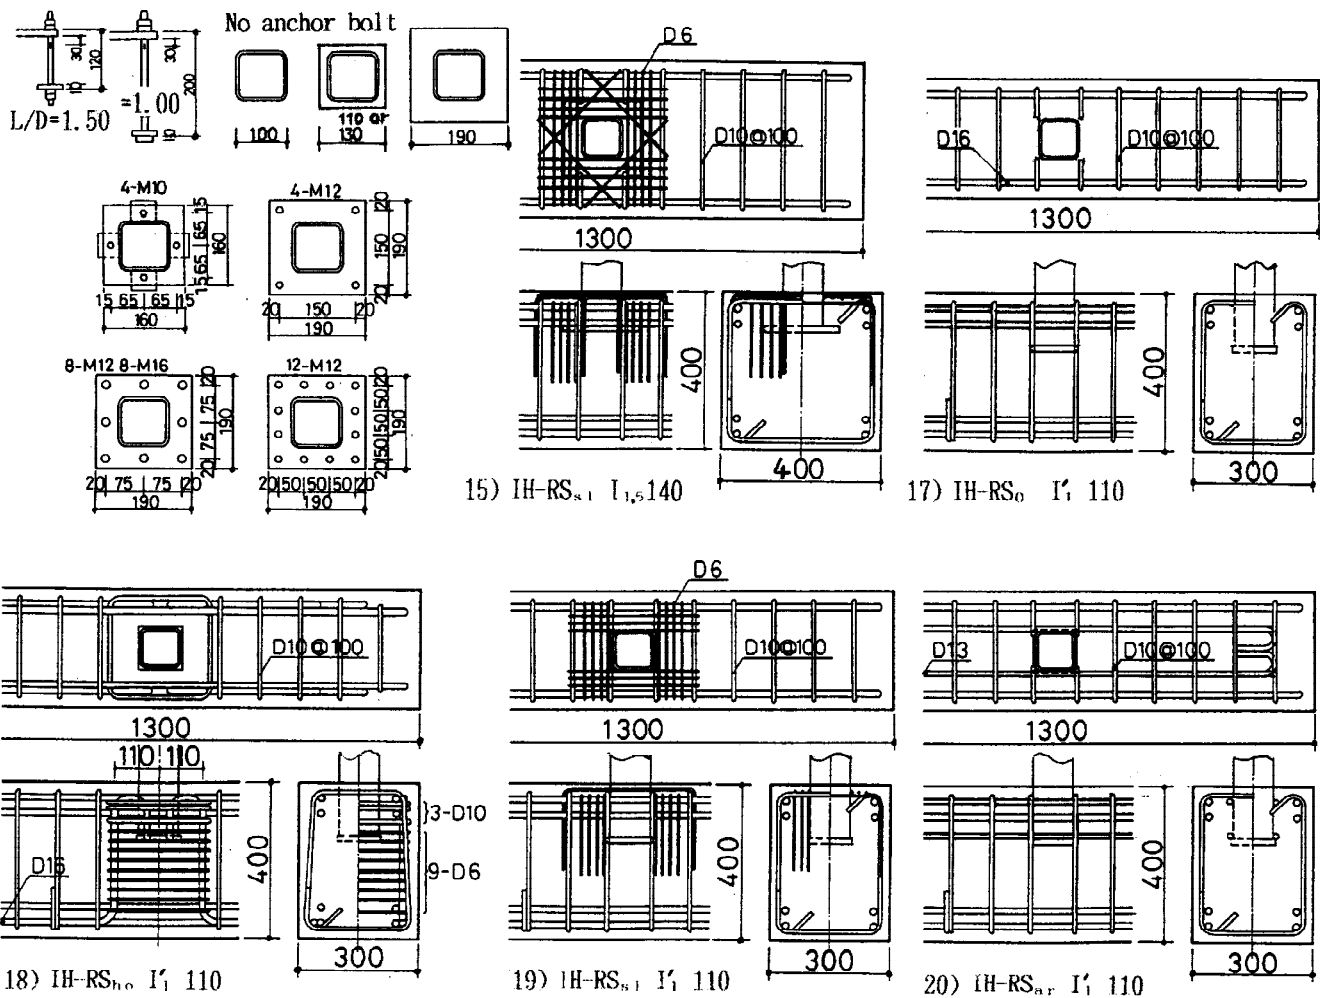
Details of anchor bolts, baseplates and reinforcements for steel column bases
